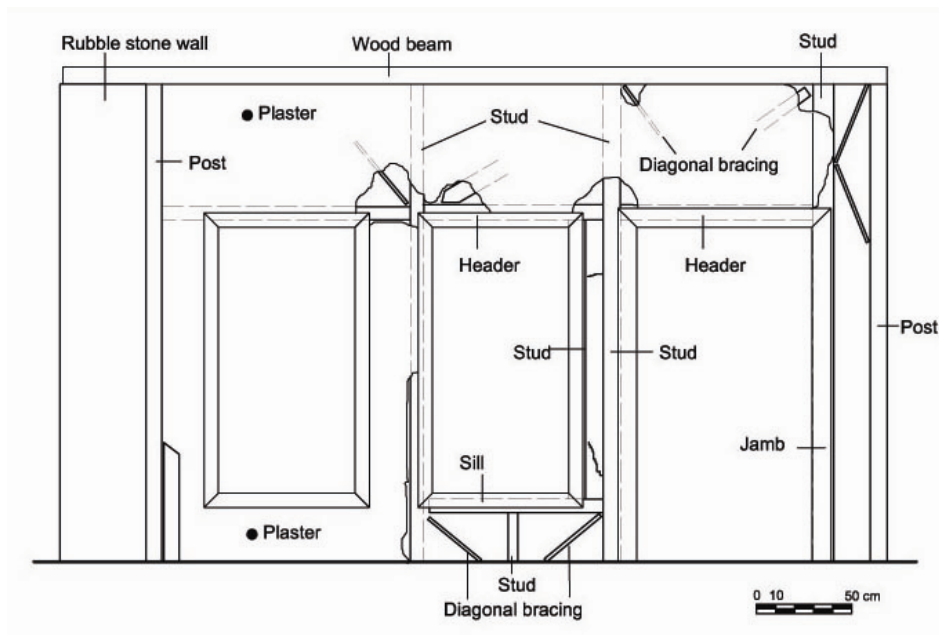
Openings in timber-framed wall. (Şahidi St. No: 26)
